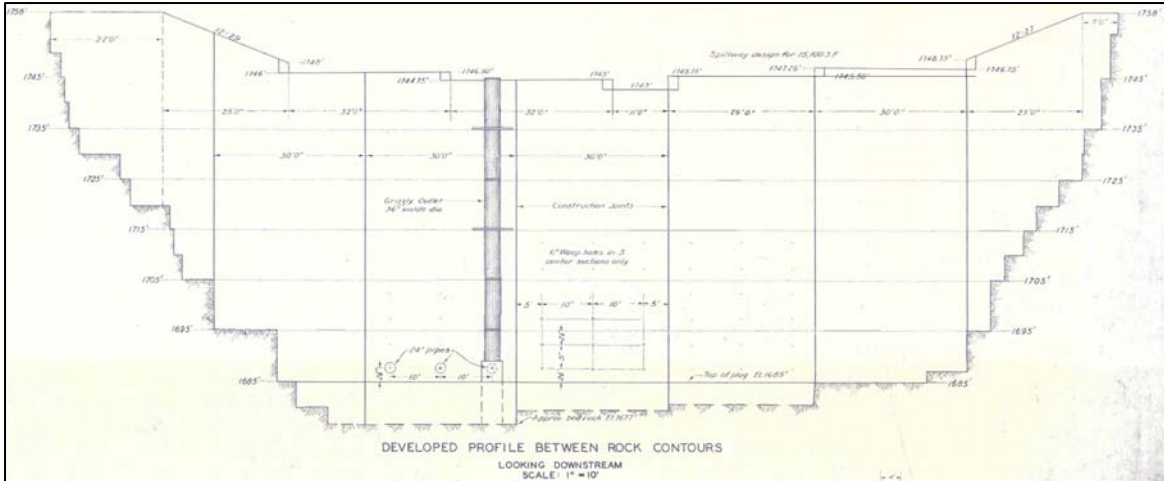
As-built construction drawing for the profile of Brown Mountain Dam looking downstream (USFS 1943).
